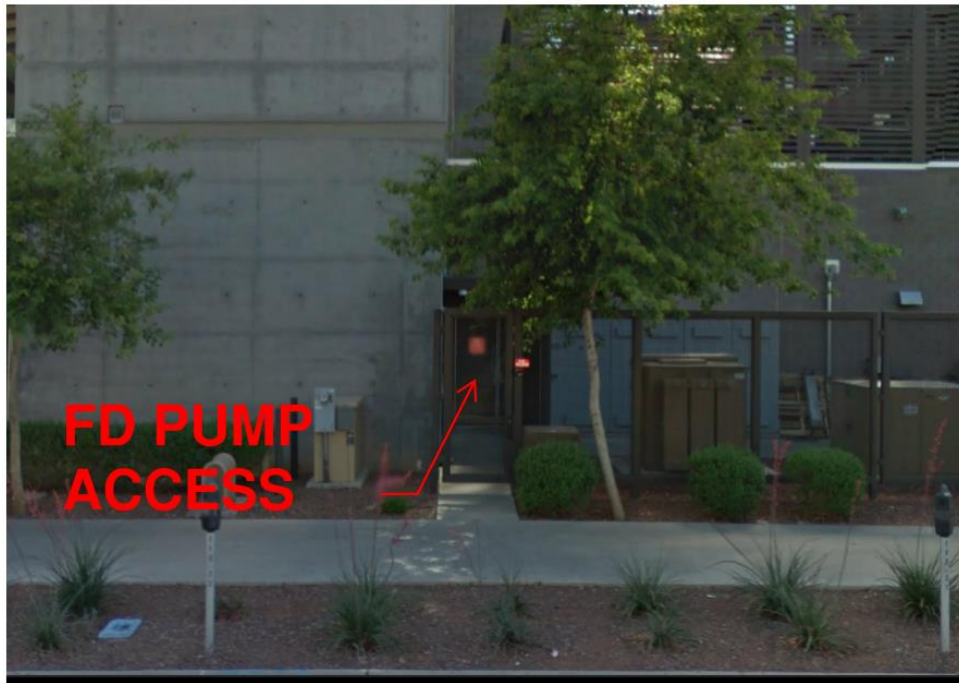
SITE PLAN AND FIRE DEPARTMENT ACCESS
